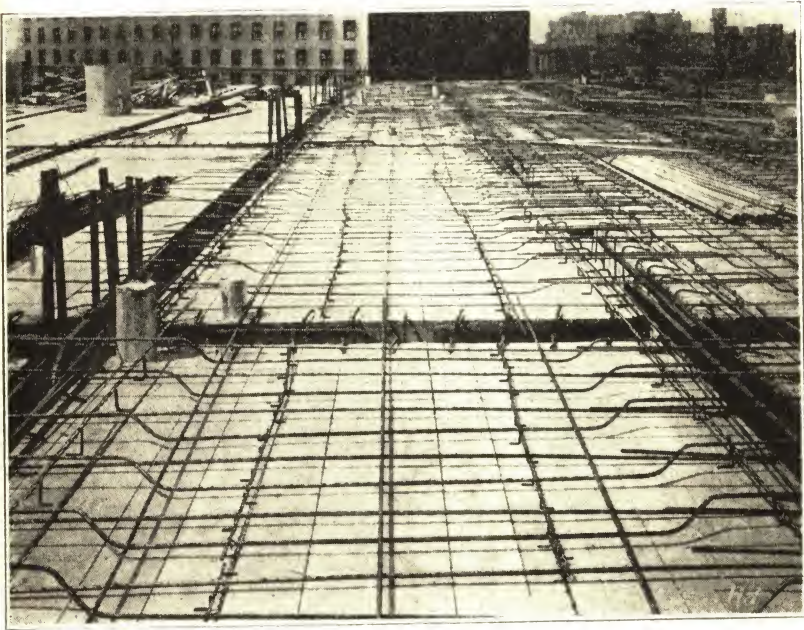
Reinforcing Steel in Place, Ready for Concreting
